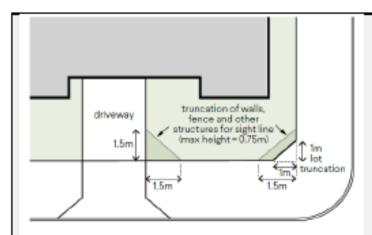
Truncation at street corner to provide sightlines (refer A3.87).
